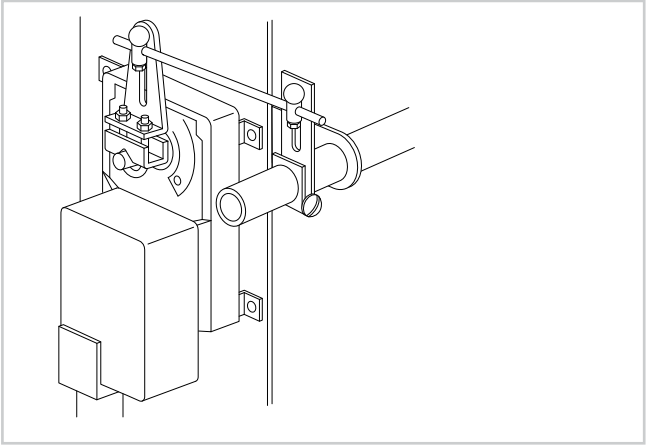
Actuator is mounted to the damper assembly connected to the jackshaft with a crank arm kit
